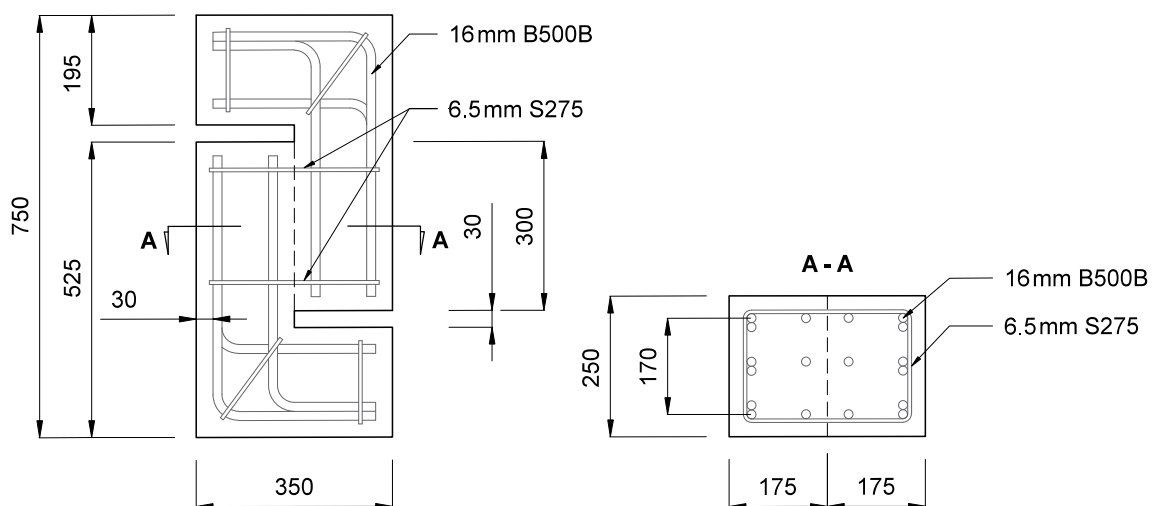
Push-off specimen geometry and reinforcement detail: long section and through section [mm].
